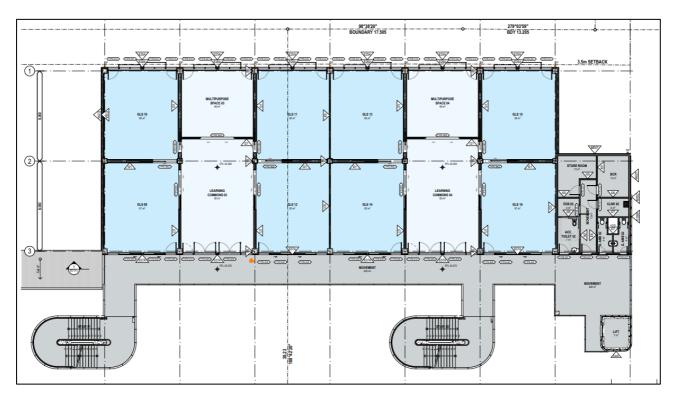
Proposed Level 1 Plan (Fulton Trotter Architects, 2025)
